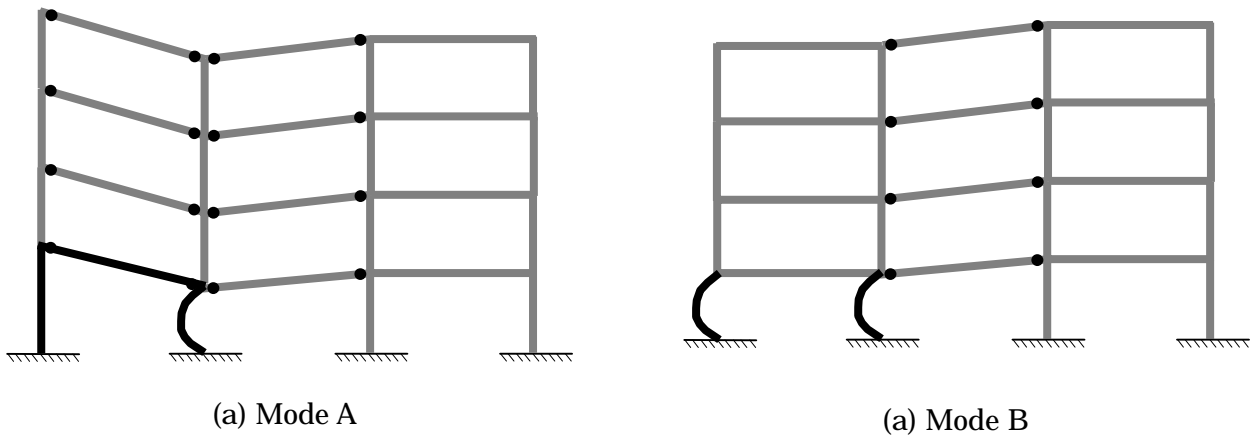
The failure mode of a steel frame when fire occurs at outer span
